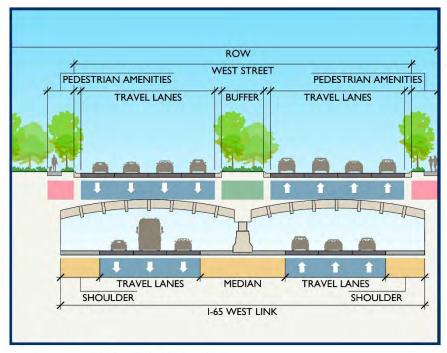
Concept 7 West Street Boulevard and Tunnel
